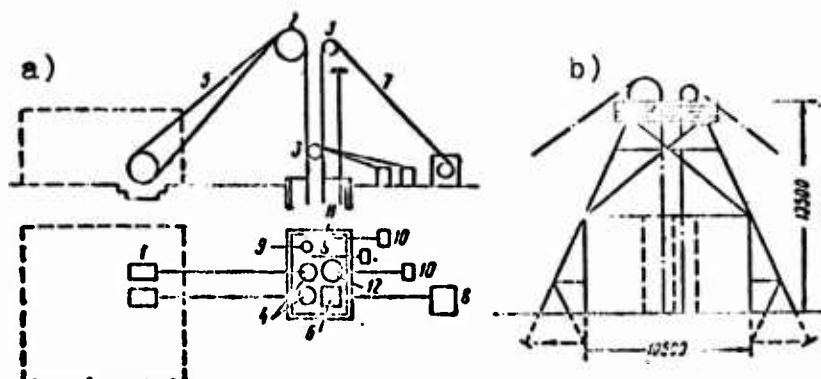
The simplest diagram of the arrangement of sinking equipment for the stem of a mine shaft a) and a diagram of a small wooden sinking pile driver b); 1 - lift machine; 2, 3 - pulleys; 4 - buckets; 5, 7 - cables; 6 - sinking pump, suspended; 8, 10 - winch with mechanical and manual drive; 9, 11 - pipelines; 12 - pneumatic loader.
